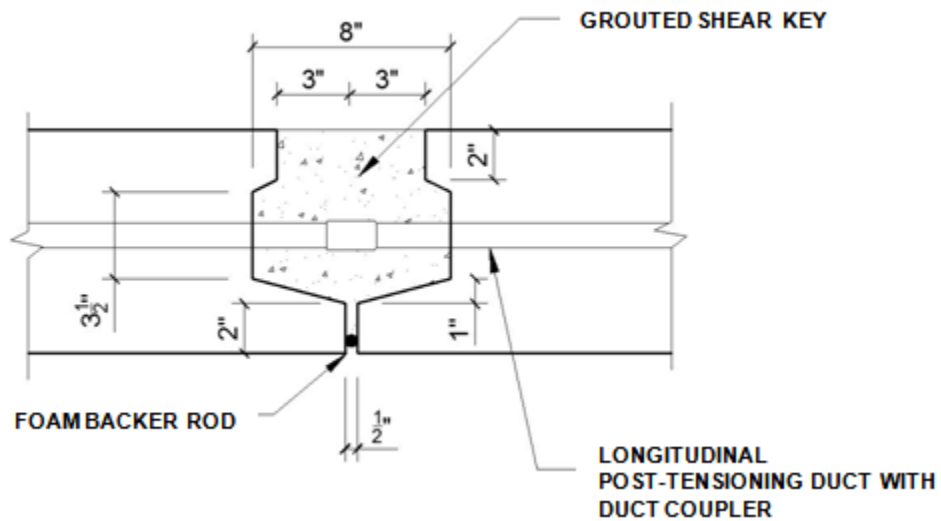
Transverse connection detail of a grouted shear key with longitudinal post-tensioning duct coupling
